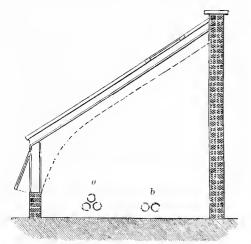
SECTION OF LEAN-TO PEACH-HOUSE, showing Position for (a) three 3in. and (b) two 4in. Hot-water Pipes.
